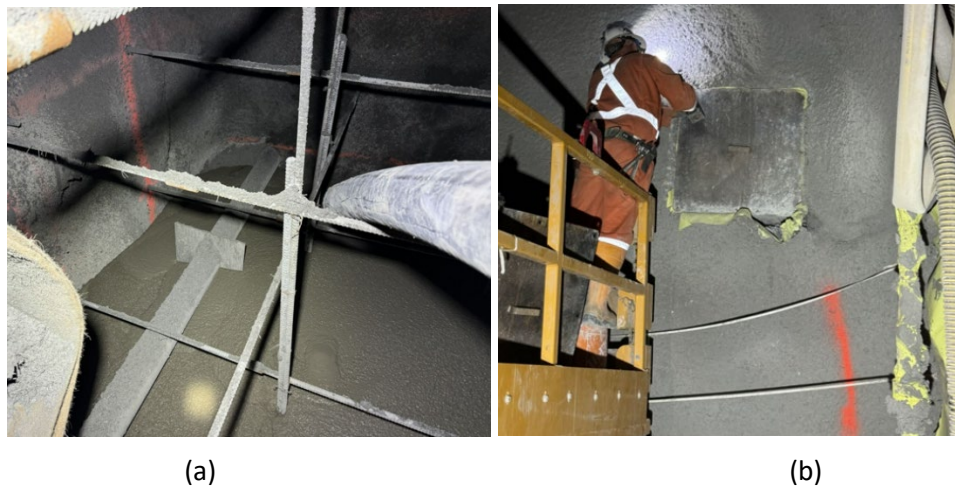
(a) Photo taken through a front wall hatch of the plug core showing the concrete tremie pipe, and flat concrete surface at the level of the upper flow-through drainage pipe; (b) Photo of the front wall showing one of the hatches being sealed, and crack and wall deformation monitoring measures via marking with spray paint and string lines (upper line disconnected and slack at this time)
